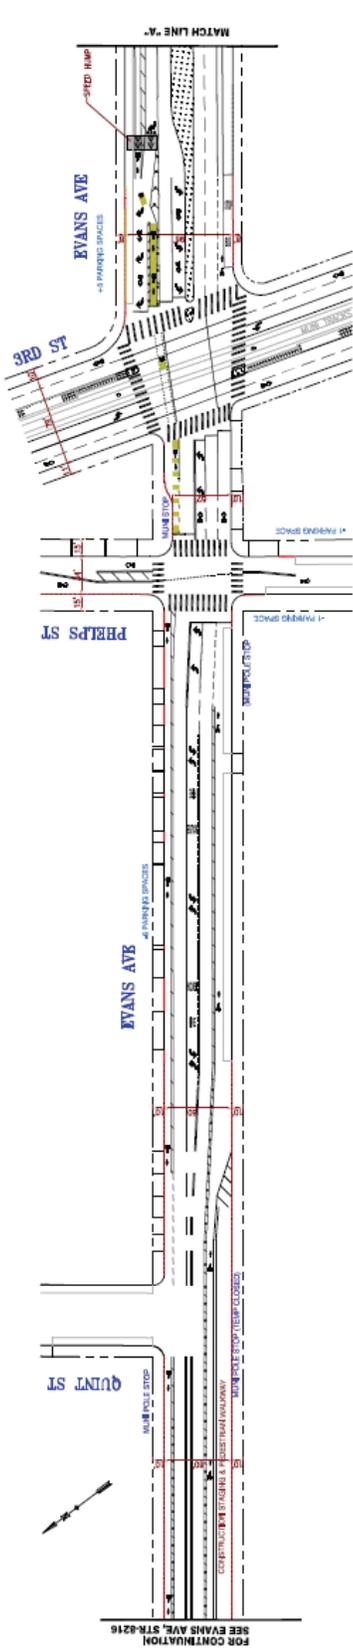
Proposed Evans Avenue Quick-Build traffic striping from Quint Street to Mendell Street (Project changes end at Newhall Street)
